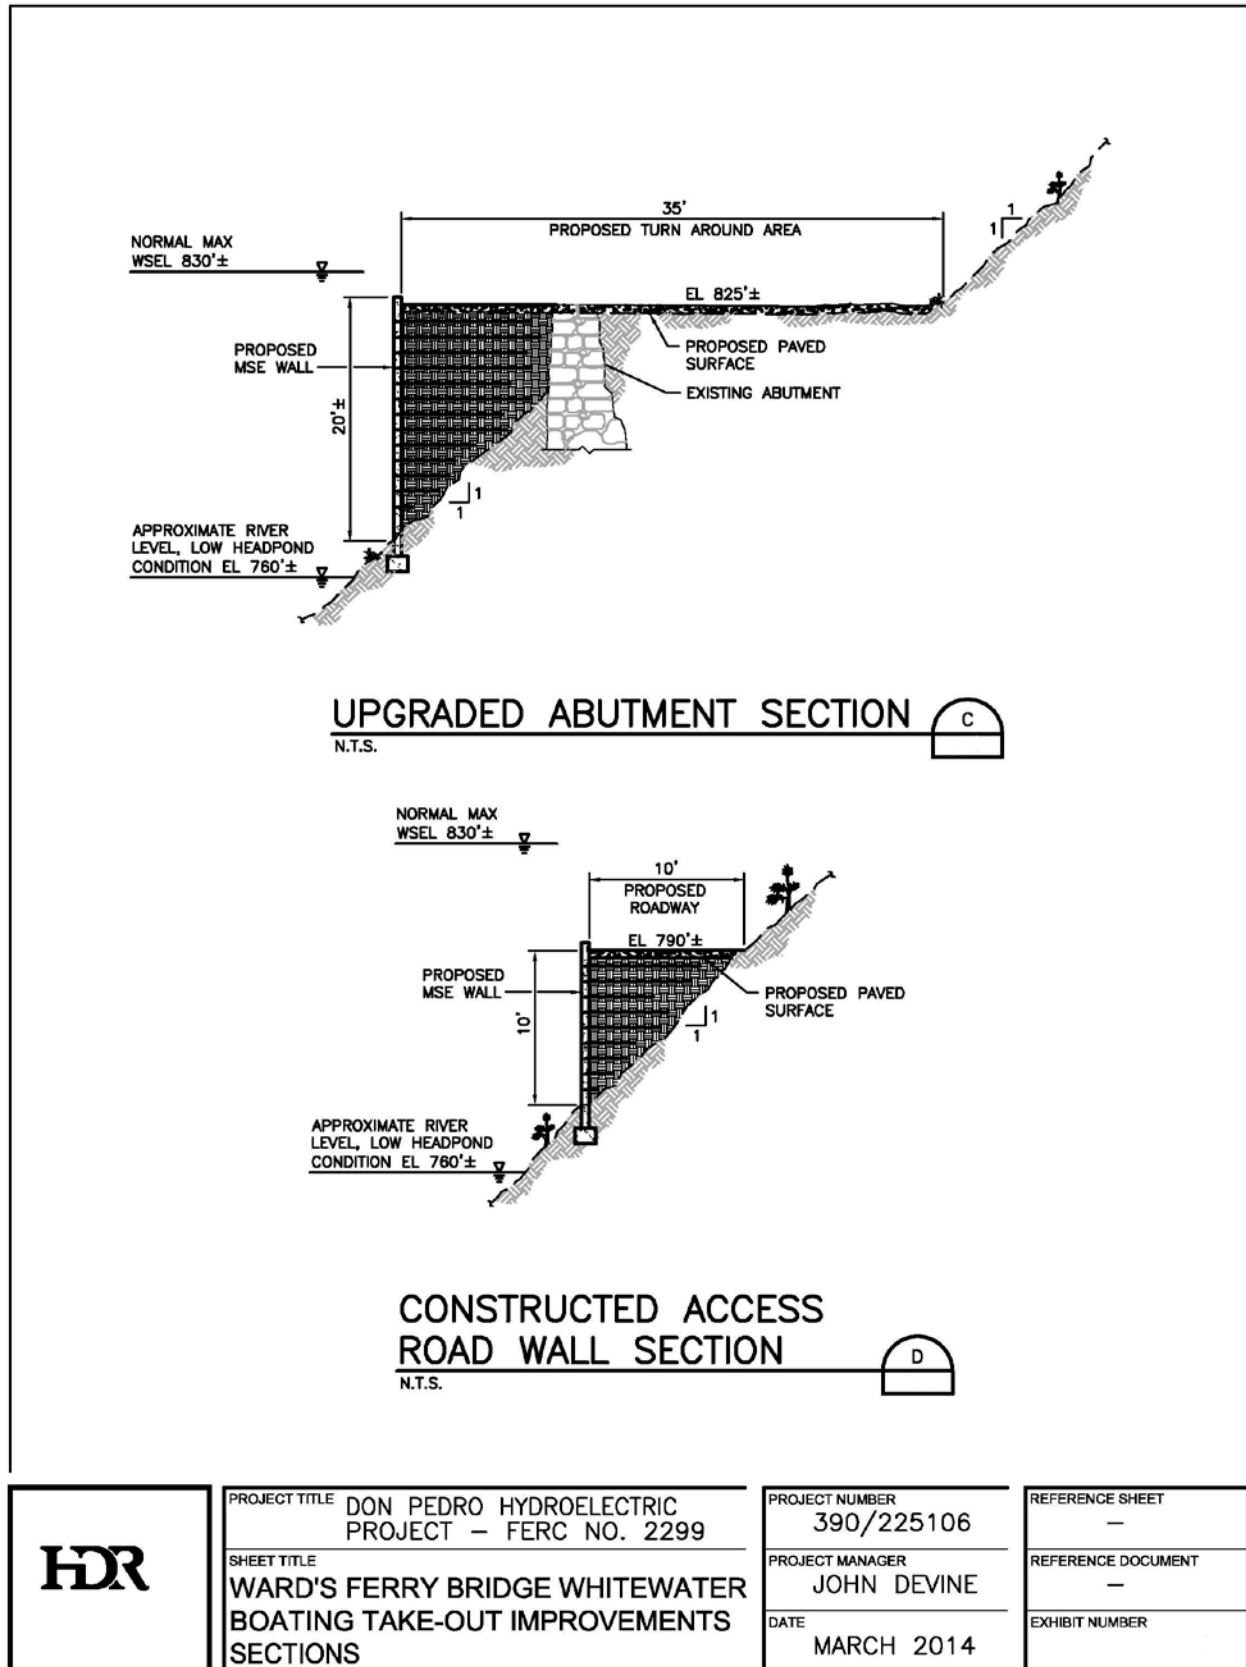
Ward's Ferry bridge whitewater boating take-out improvements -- sections.
